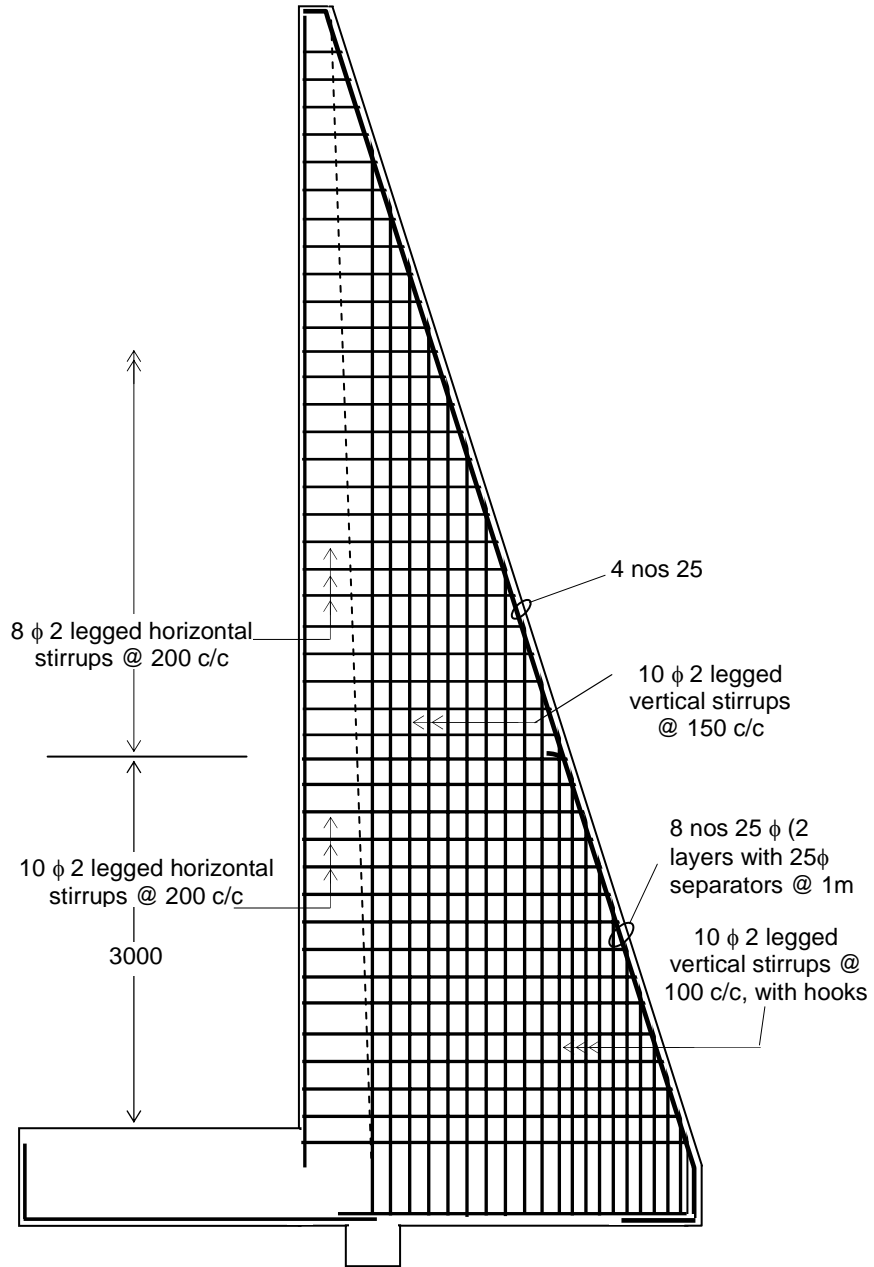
Section through counterfort showing counterfort reinforcement
